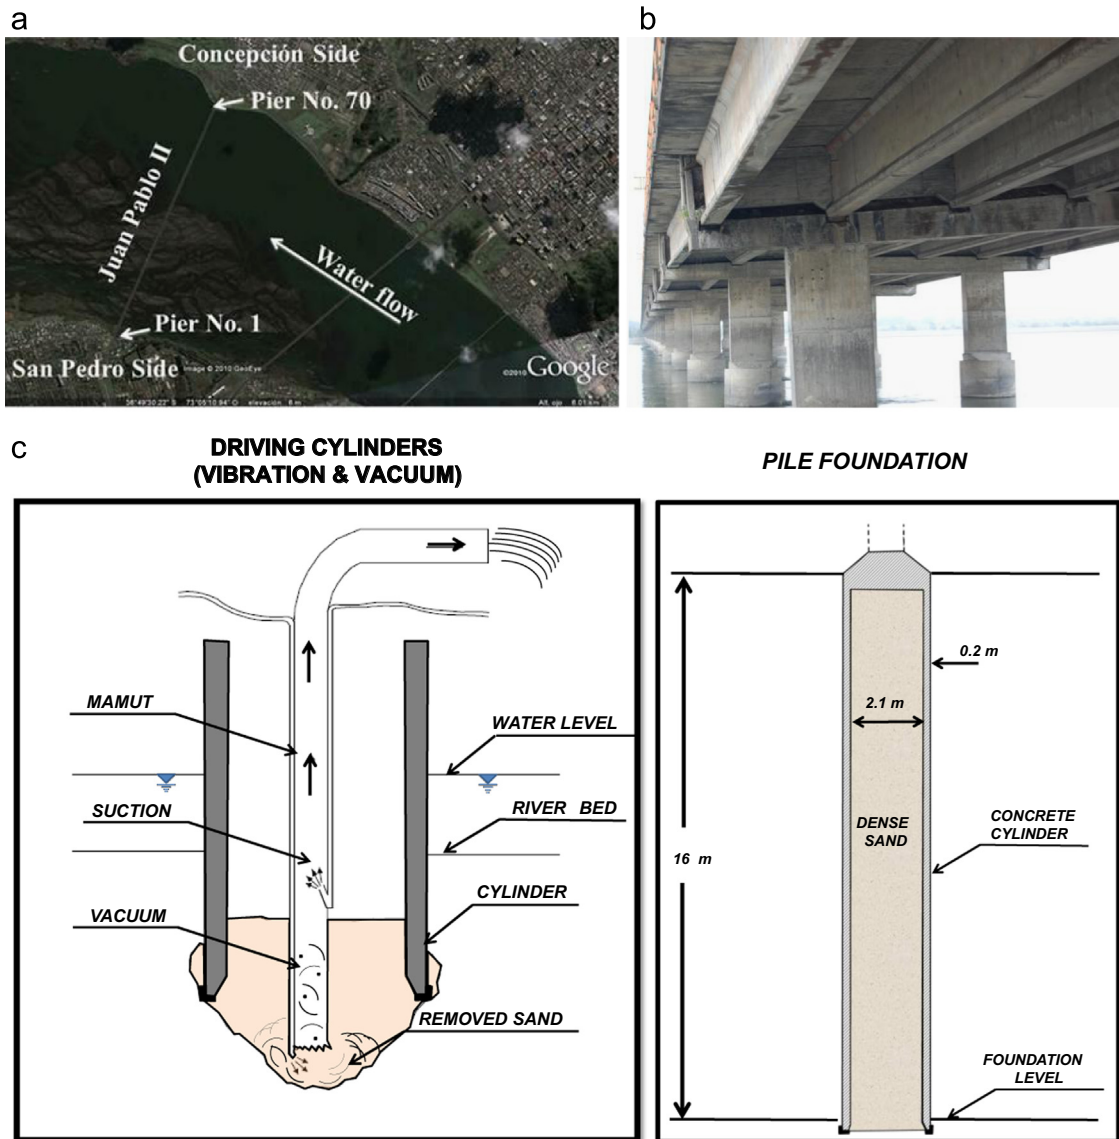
(a) Location of Juan Pablo II Bridge, (b) Settlement of supporting structure and (c) Construction System and Pile Foundation.
